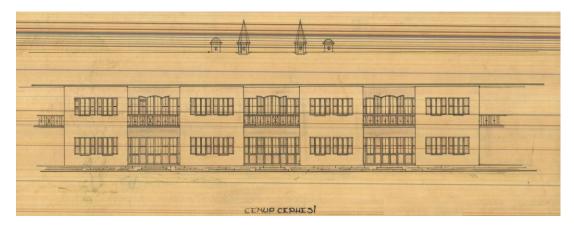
The original drawing of the double storey dwellings of officers, the south elevation, scale 1/100, Construction Section in General Directorate of TEKEL, 10.10.1944 (Source: TTA Archive)
